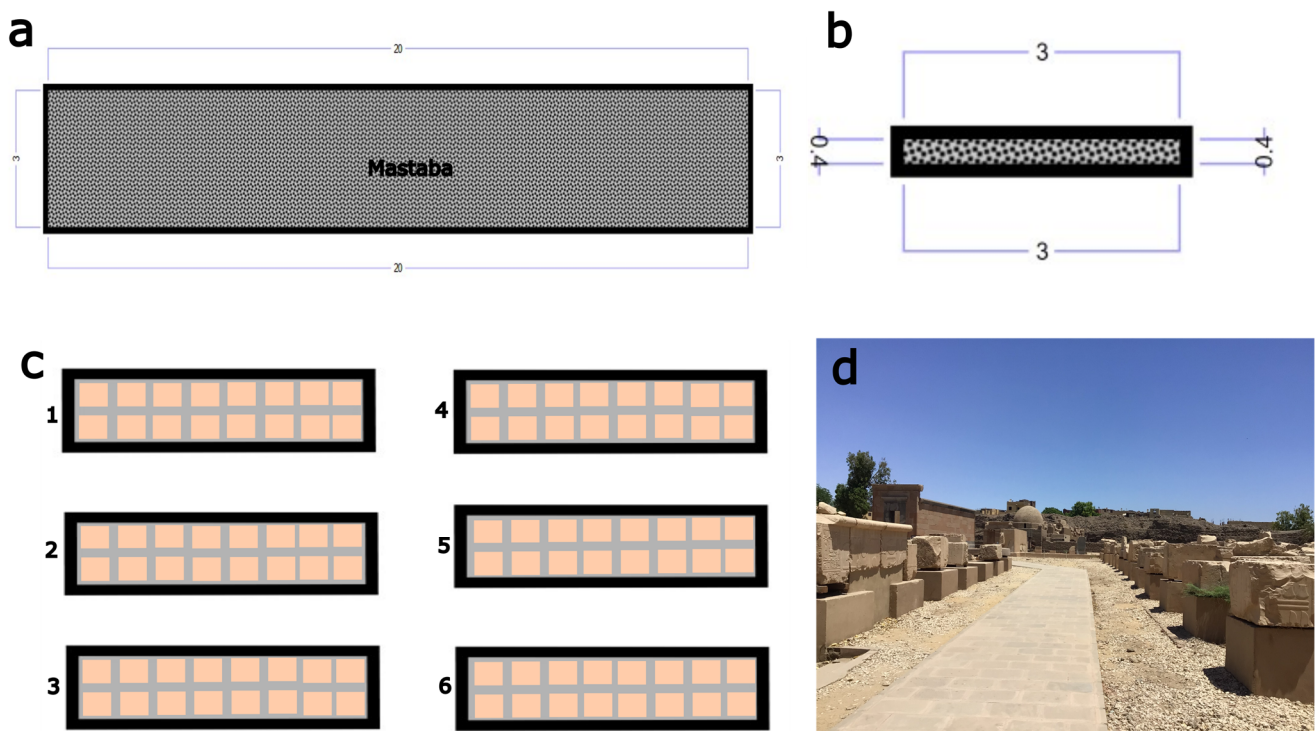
(a) The dimension of a Mastaba (20 m × 3 m); (b) cross-section of a Mastaba and its dimensions (3 m × 40 cm); (c) suggested system for six Mastabas constructions to lift around 144 stone blocks in the northeast corner (phase 1) over them. (d) Conducted a previous project to lift the stone blocks upon the Mastabas as part of the Karnak Open Museum (in front of the chapel of Hatshepsut), executed by the Egyptian Ministry of Tourism and Antiquity.
